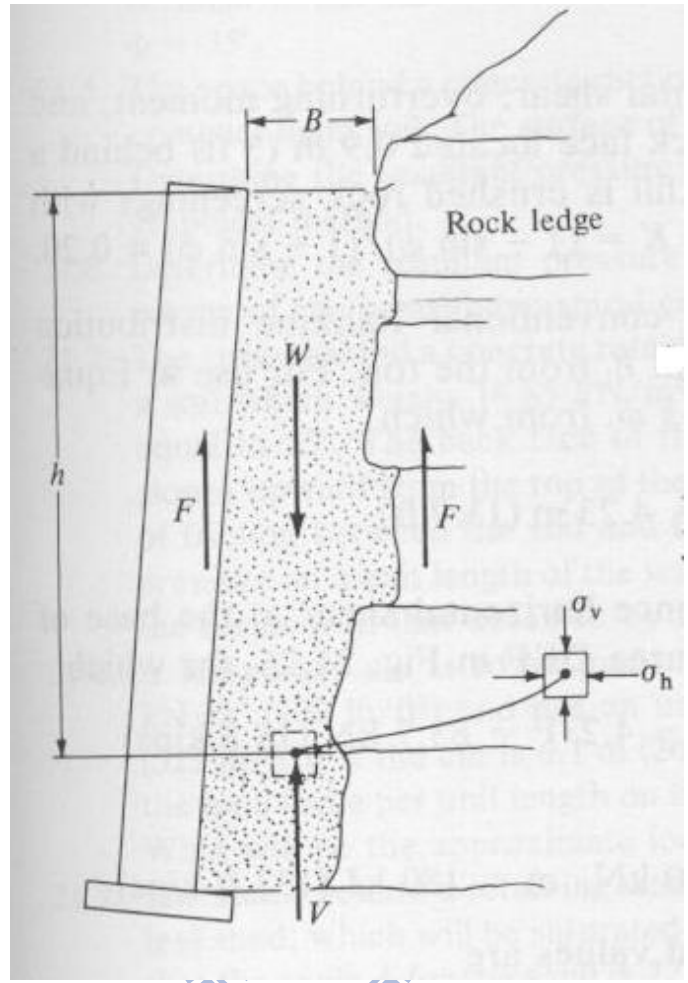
Fascia retaining wall of backfill width B and wall friction F (after Spangler and Handy, 1984)
